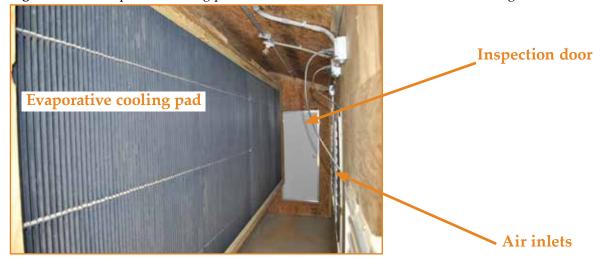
Example of a cooling pad installed on the sidewall of the house in a doghouse.
